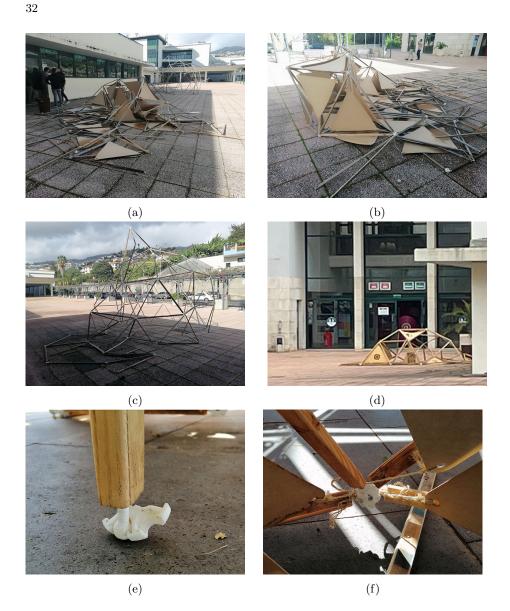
(a) Whale Dome collapse. (b) Whale Dome collapse. (c) Dolphin Dome collapse. (d) Smaller Dome collapse. (e) Broken connector. (f) Broken connectors.
